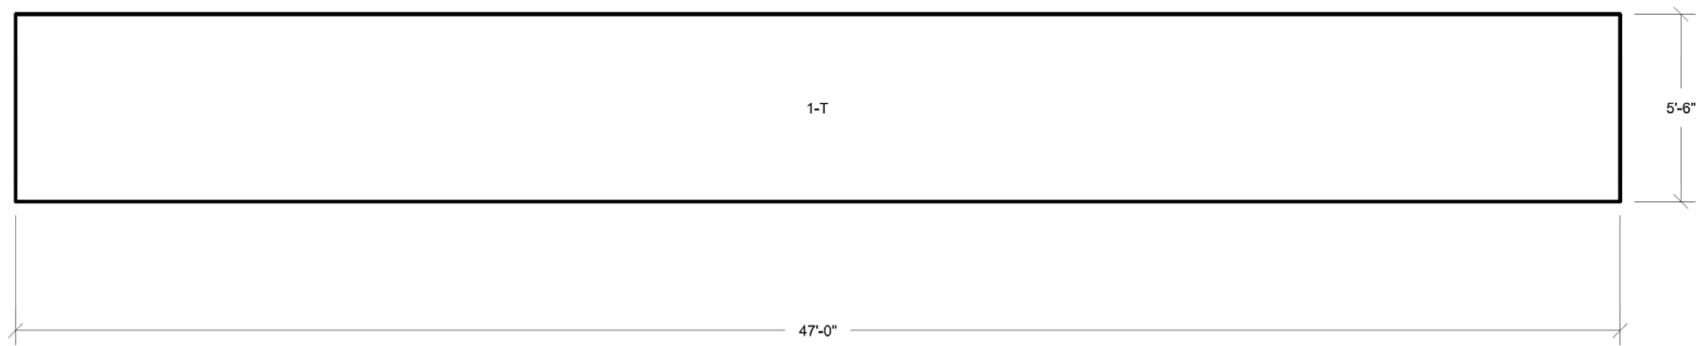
H.7-17 Tunnel and Access Region Basemat Looking Down Transverse Reinforcement Zones
